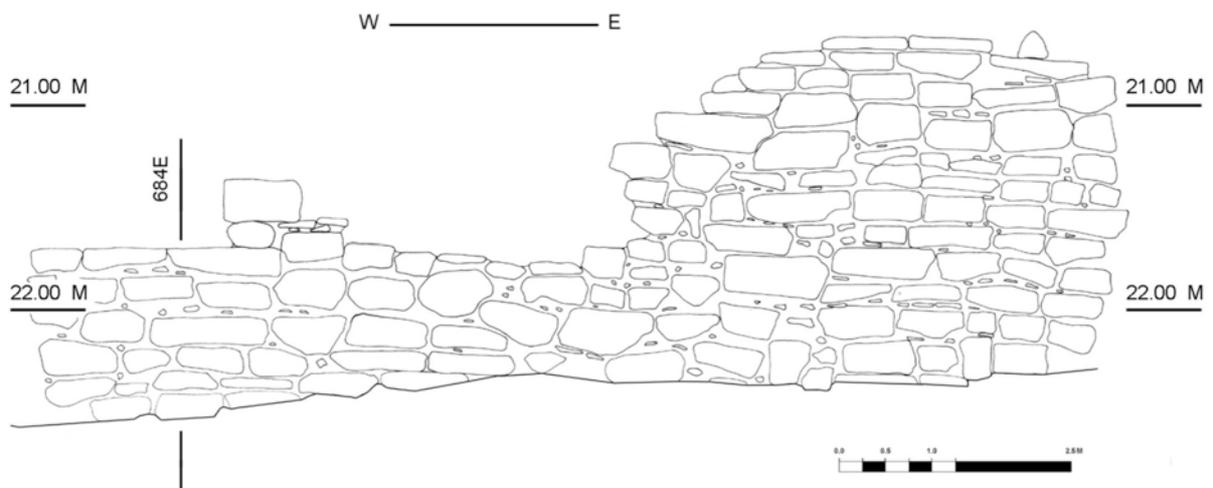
Area A, Square A 22. Elevation of the southern Wall [9] of Room 28. Scale 1:40.
